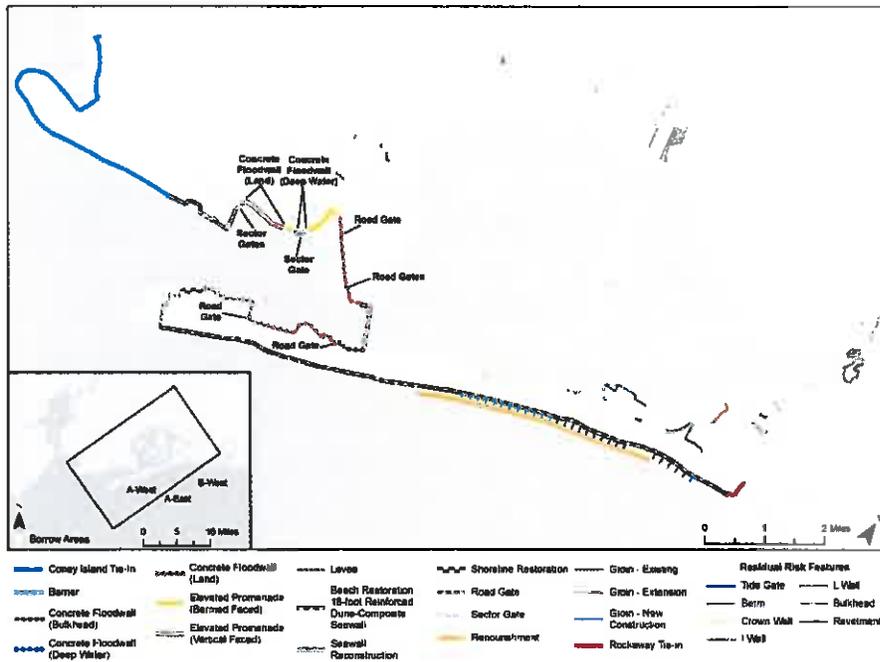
Depiction of the TSP with storm surge barrier alignment C-1E.
